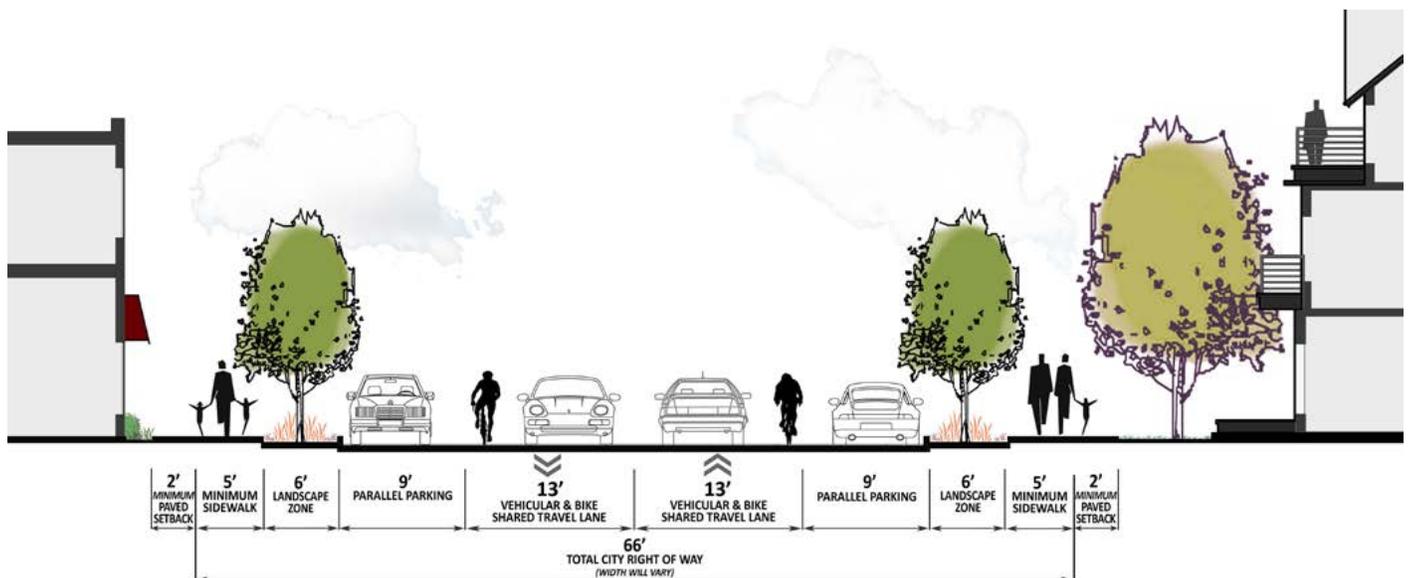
(1). 200 E and 400 E Cross Section and Plan-view
